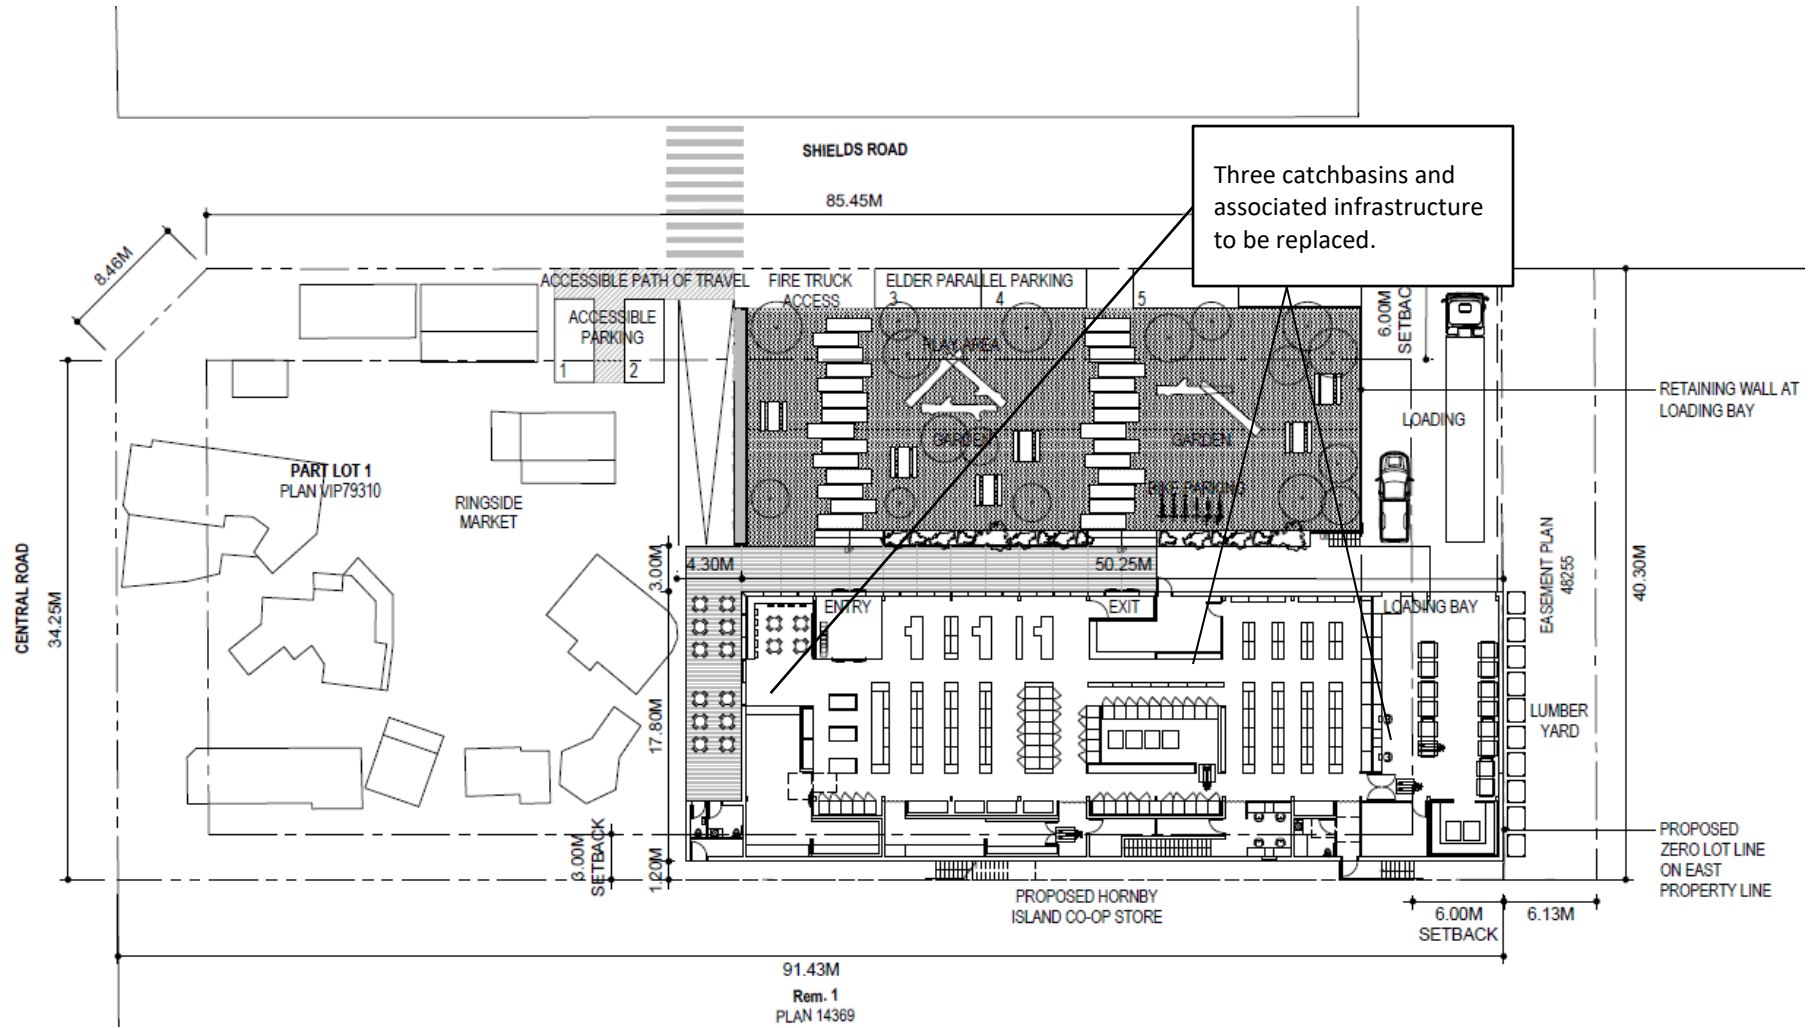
Proposed Site Plan. Source: Leckie Studio Architecture + Design
